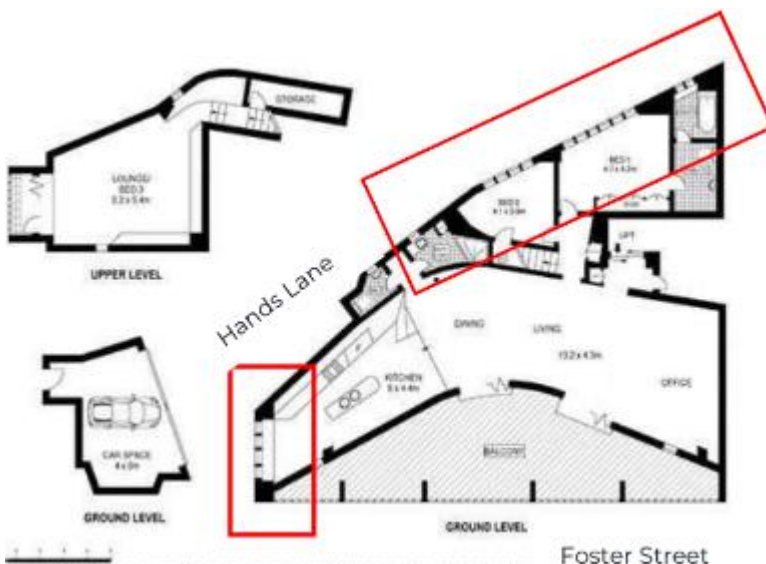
Floor plan of Level 6. Source: realestate.com.au
